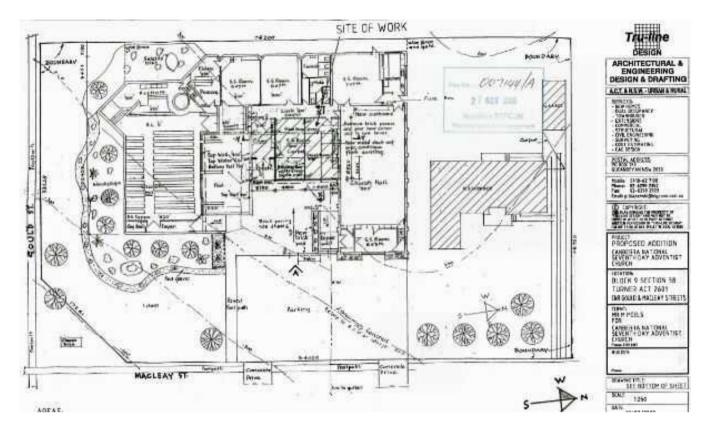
Plans showing the extension to the buildings. These were approved in November 2000, with construction completed in 2001 (ACTPLA in Hyperspace 2020)
